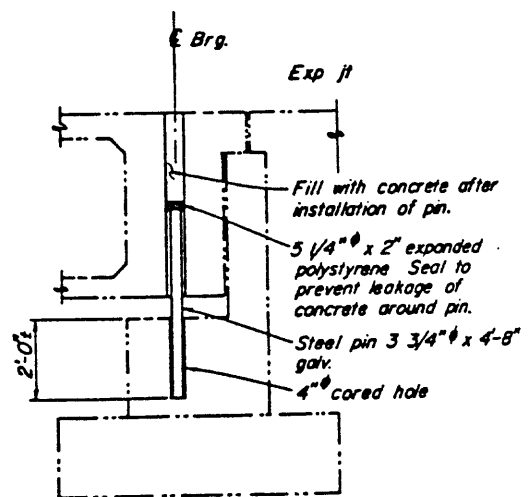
shows how steel girders can be given additional longitudinal and transverse restraint at an abutment. A method used for restraining steel girders transversely is shown in Figure 31.
